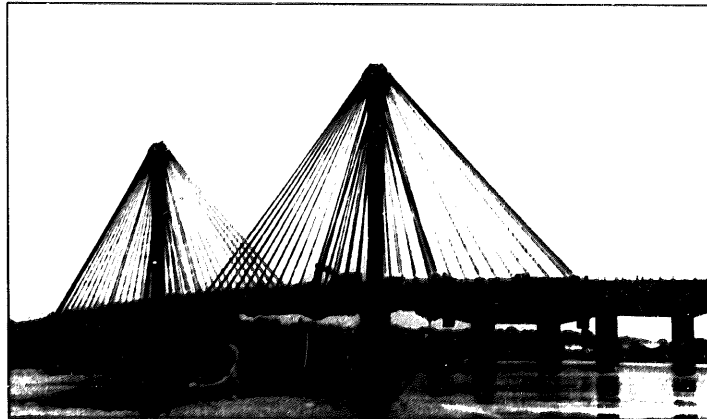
Modern cable-stayed suspension bridge (under construction). Note the massive towers and the concrete bents supporting the approach spans.
